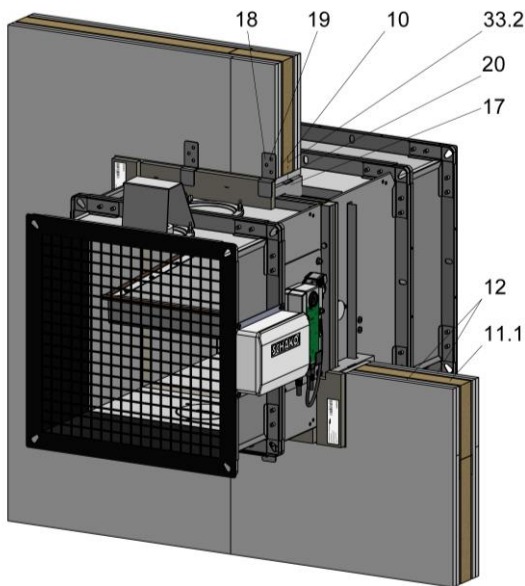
BKA-Ü with installation frame type ER-A1 in lightweight partition wall
